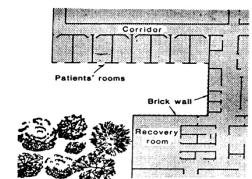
Plan of the second floor of the study hospital showing the trees versus wall window views of patients. Data were also collected for patients assigned to third-floor rooms. One room on each floor was excluded because portions of both the trees and wall were visible from the windows. Architectural dimensions are not precisely to scale.
